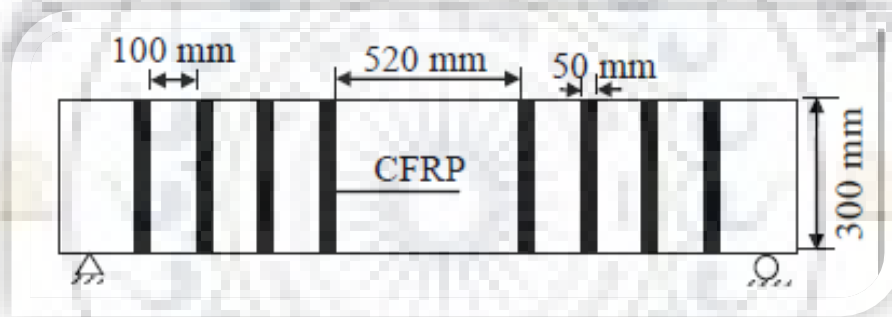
Arrangement of CFRP laminate in retrofitted beams.
